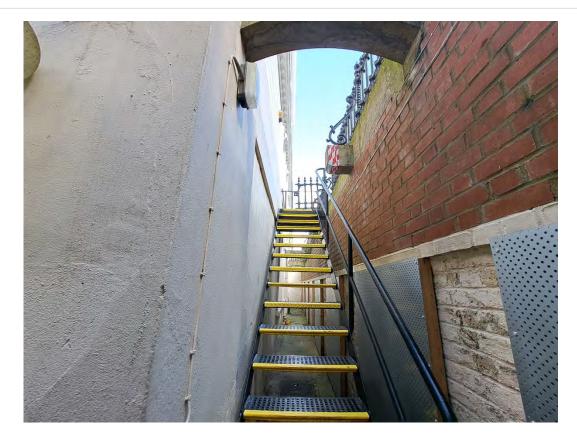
External staircase from ground level to lower ground level on the eastern side of building.
